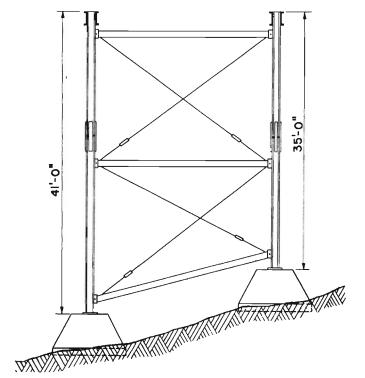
Bracing of framed steel tower modified to suit footings set at different levels.
